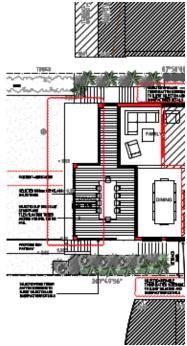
Extract of amended ground floor plan depicting amended stepped alignment of rear terrace
